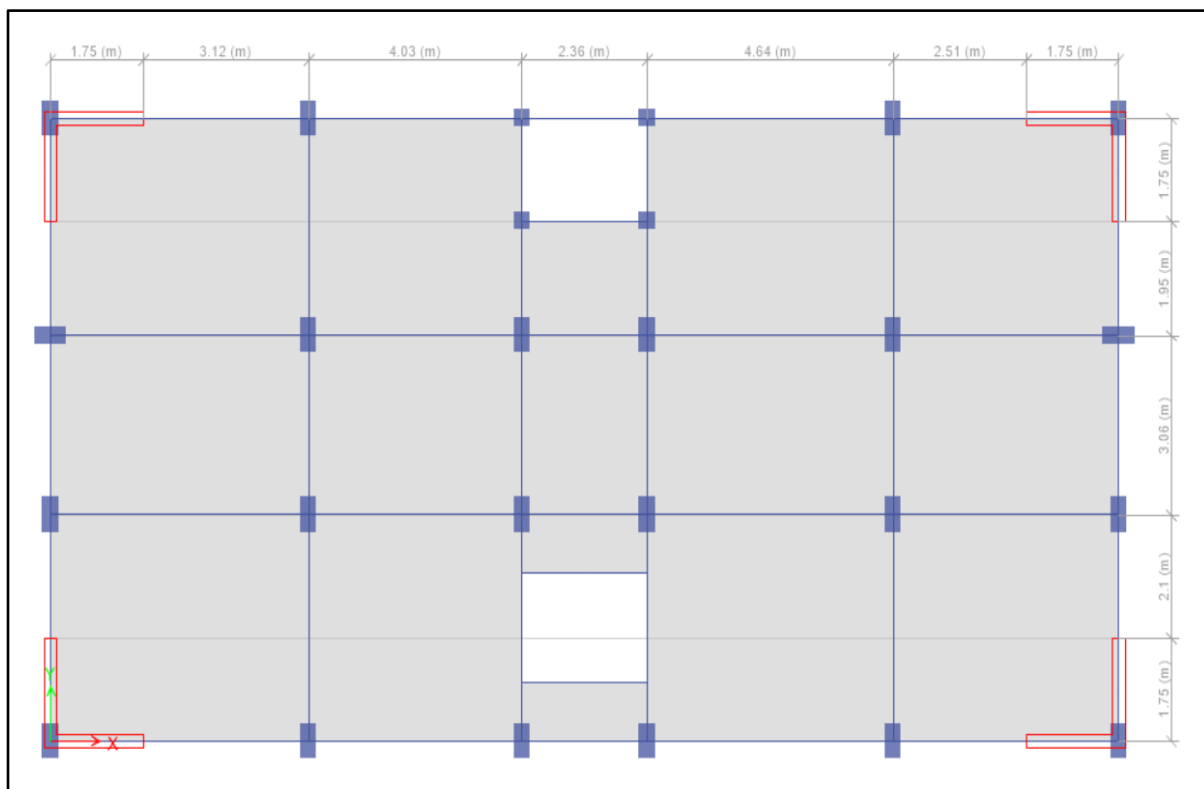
Shear Wall at Corner along Periphery of Structure in L Shape plan in ETABS
